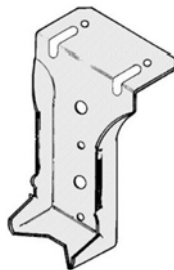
TYPICAL TF24 PANELIZED ROOF HANGER (See Table 3, this page)
